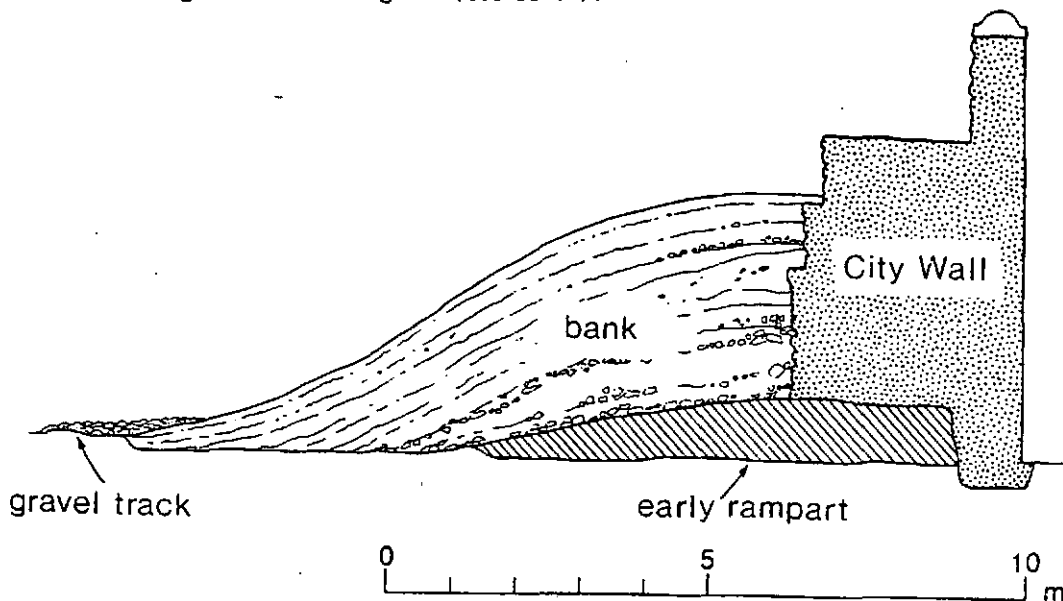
Reconstructed sketch section of Roman City Wall and bank in Paul Street area (J. Brayne)
